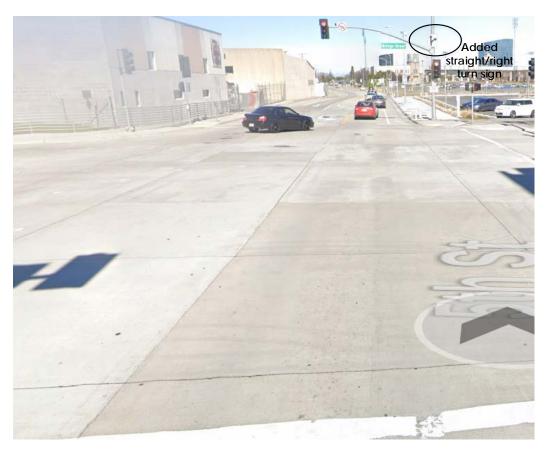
Caltrans' sign addition for northbound 5th Street on the north side of the intersection at the South River Road exit ramp. Image courtesy of Google Street View.
